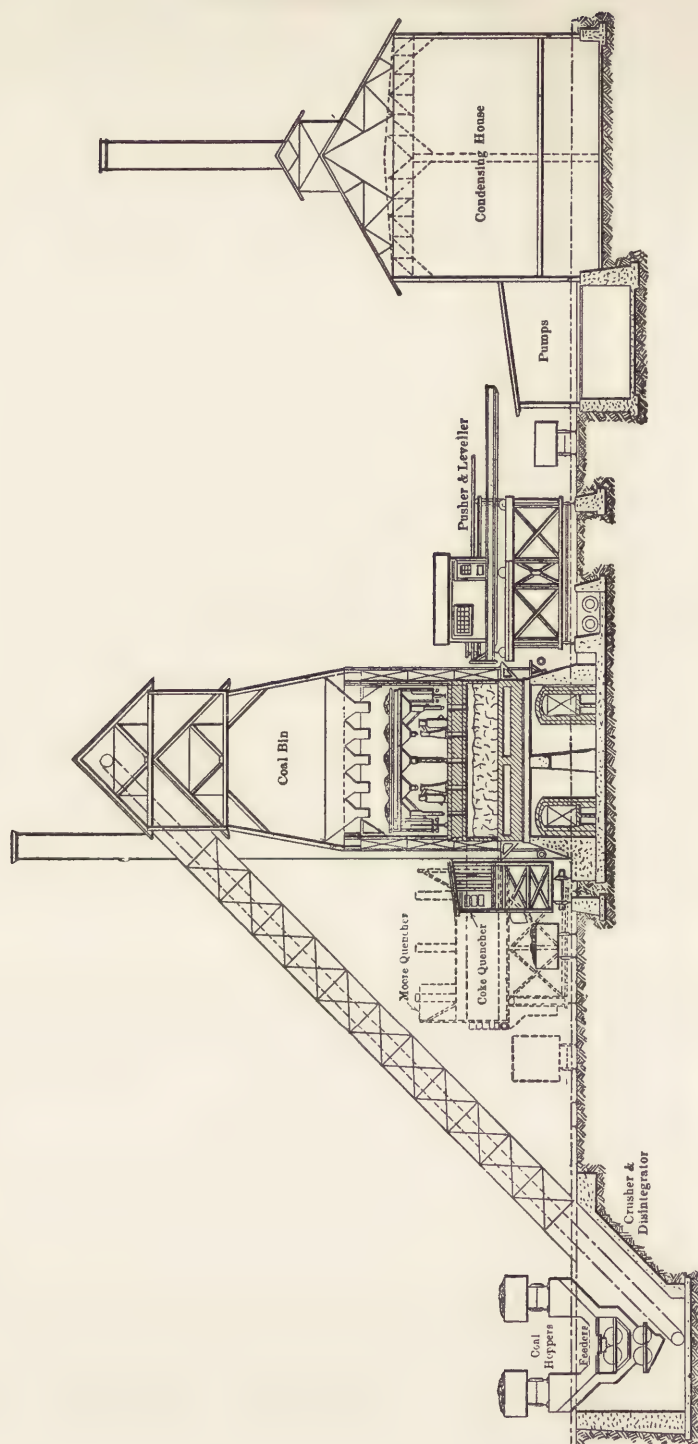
GENERAL ARRANGEMENT OF 100 UNITED-OTTO OVEN PLANT WITH PROVISION FOR EXTENSION TO 200 OVENS. CROSS-SECTION.
